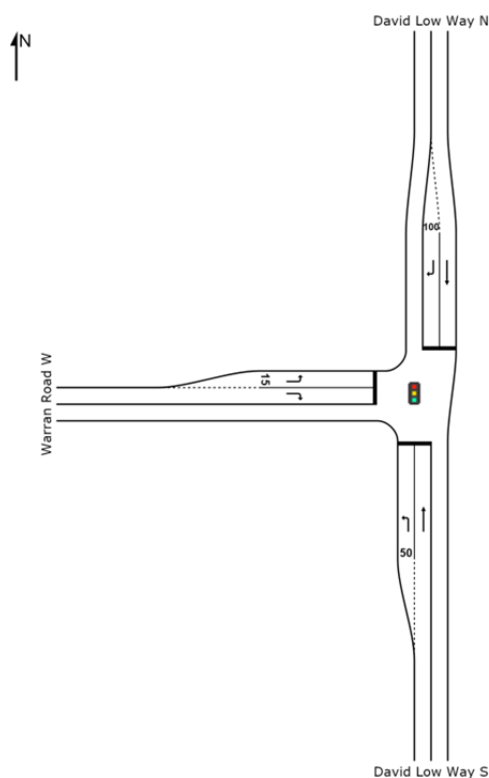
Signalised Warran Road / David Low Way Intersection Layout
